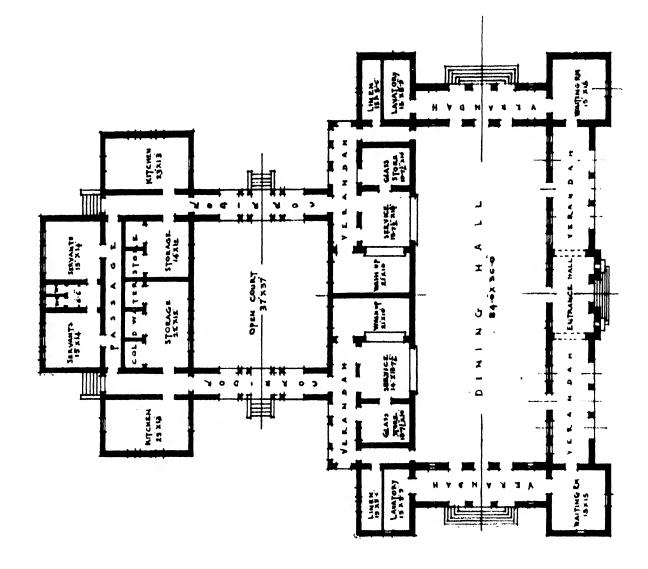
PLATE XXX - Dining Hall and Kitchen-Ground Floor.
